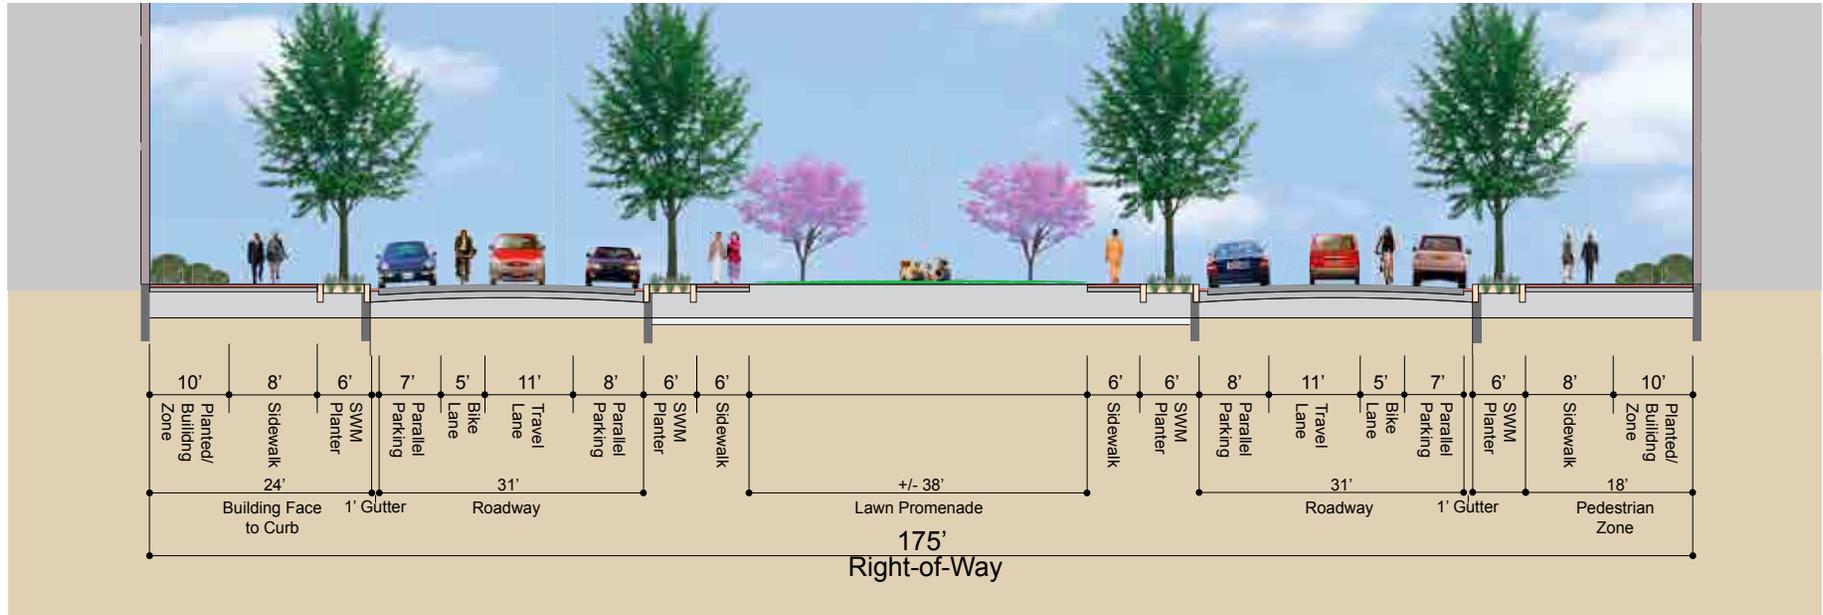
B. 13th Street Section. Source: Lee & Associates, Inc.
